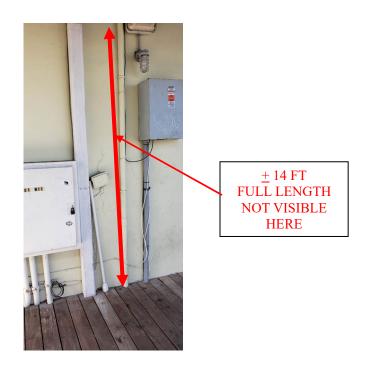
Location 23: Approximately 14 ft long new 16x8 concrete column. See detail 6/S104.
